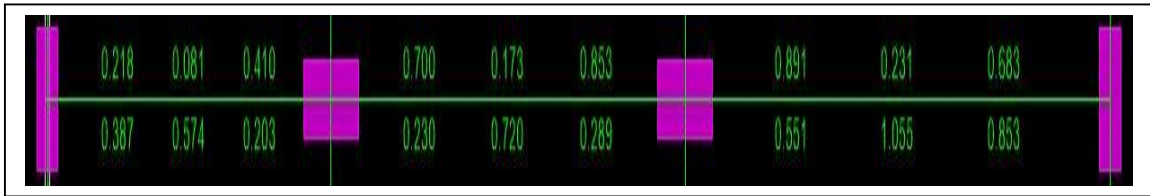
Steel Area of Roof Floor Beam X-axis
